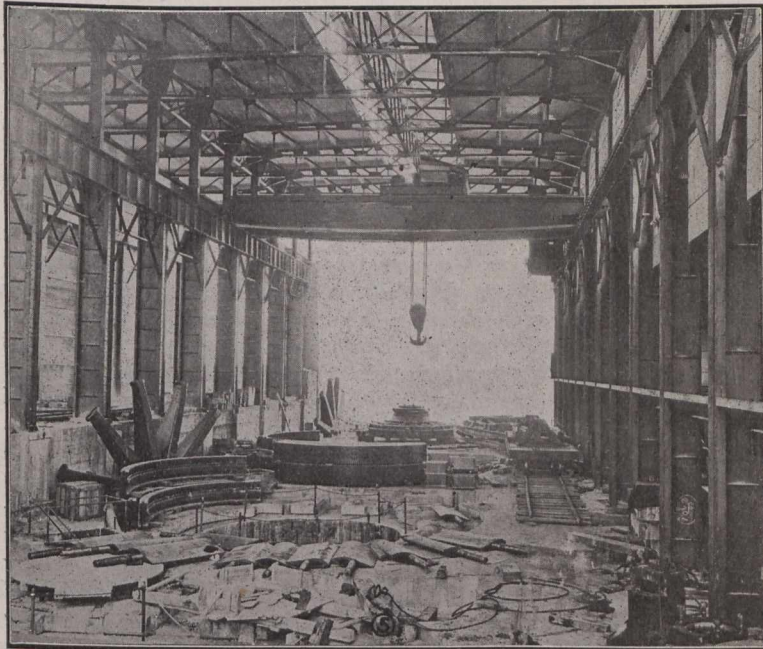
Interior view, showing unassembled parts of water-wheel and generator.
